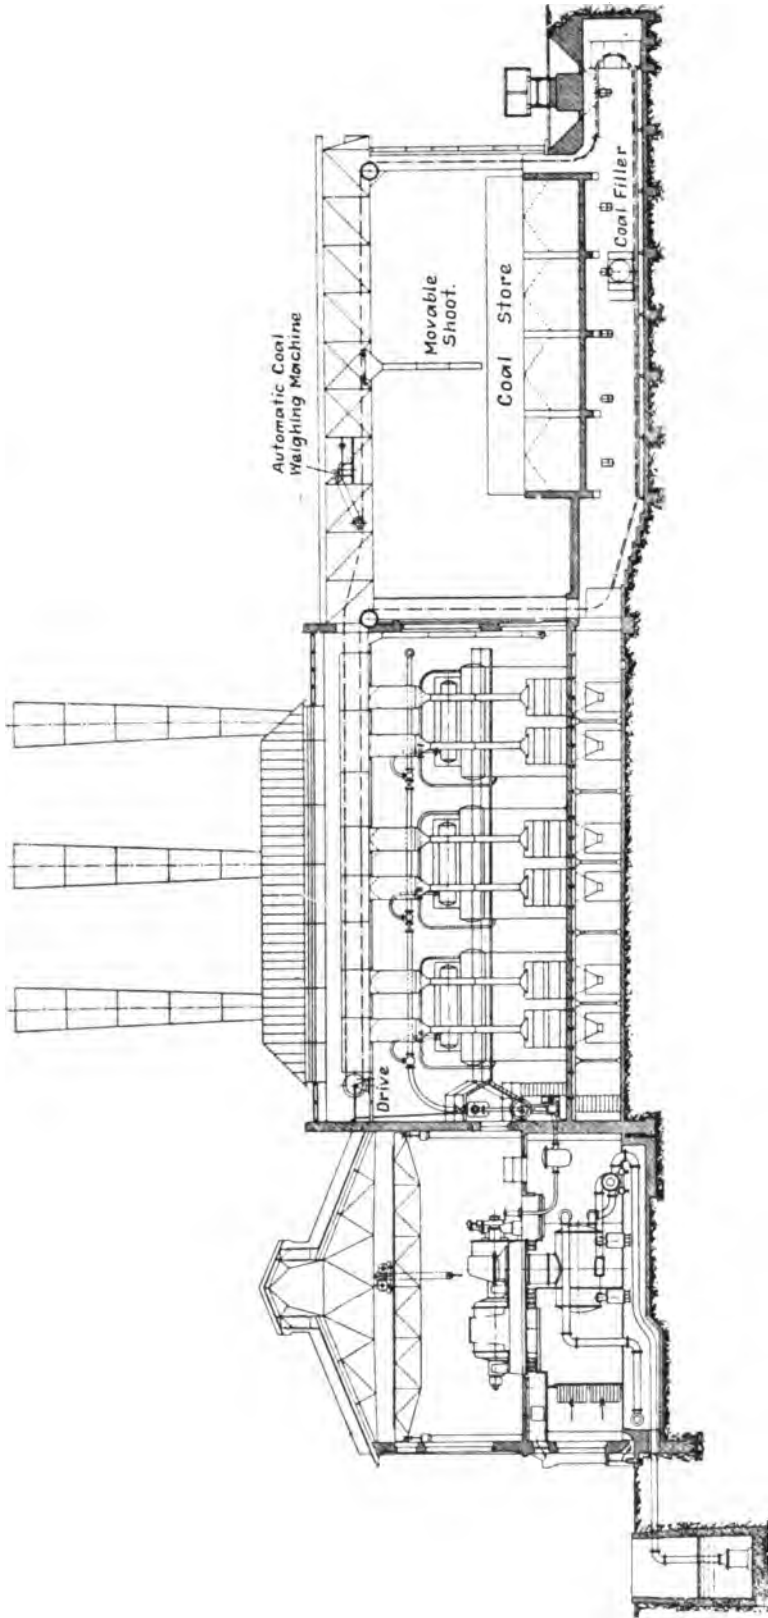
Arrangements for coal transport at the Obererzgebirg Electricity Works. Endless chain bucket conveyor used for unloading the railway trucks, discharging coal in the storage yard, drawing the trucks to the coal hoppers of the boiler house, and conveying the coal from the storage yard to the boiler house, with travelling discharge shoot. The bucket chain is driven by a 5 H.P. electric motor. The capacity of the coal store is 35,300 cub. ft. Present output of the power station, 8,000 kw. For the present it seems therefore advisable to employ trucks running on rails, which are raised without discharging from the basement by means of a lift or an inclined moving plane.
